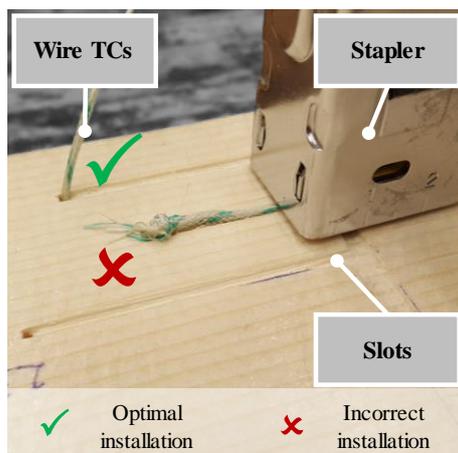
Installation of the wire thermocouples (TCs) in specimen TS03.
